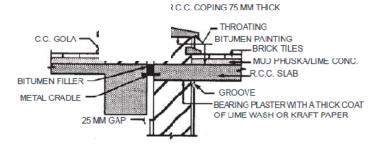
Typical Details of Expansion Joint at Wall & Beam Junction
